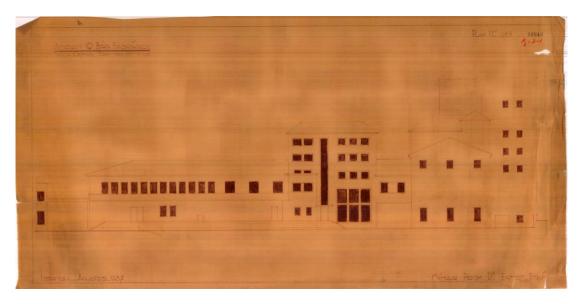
The south elevation drawing of the second proposal, 1937, Egli (Source: TTA Archive)
